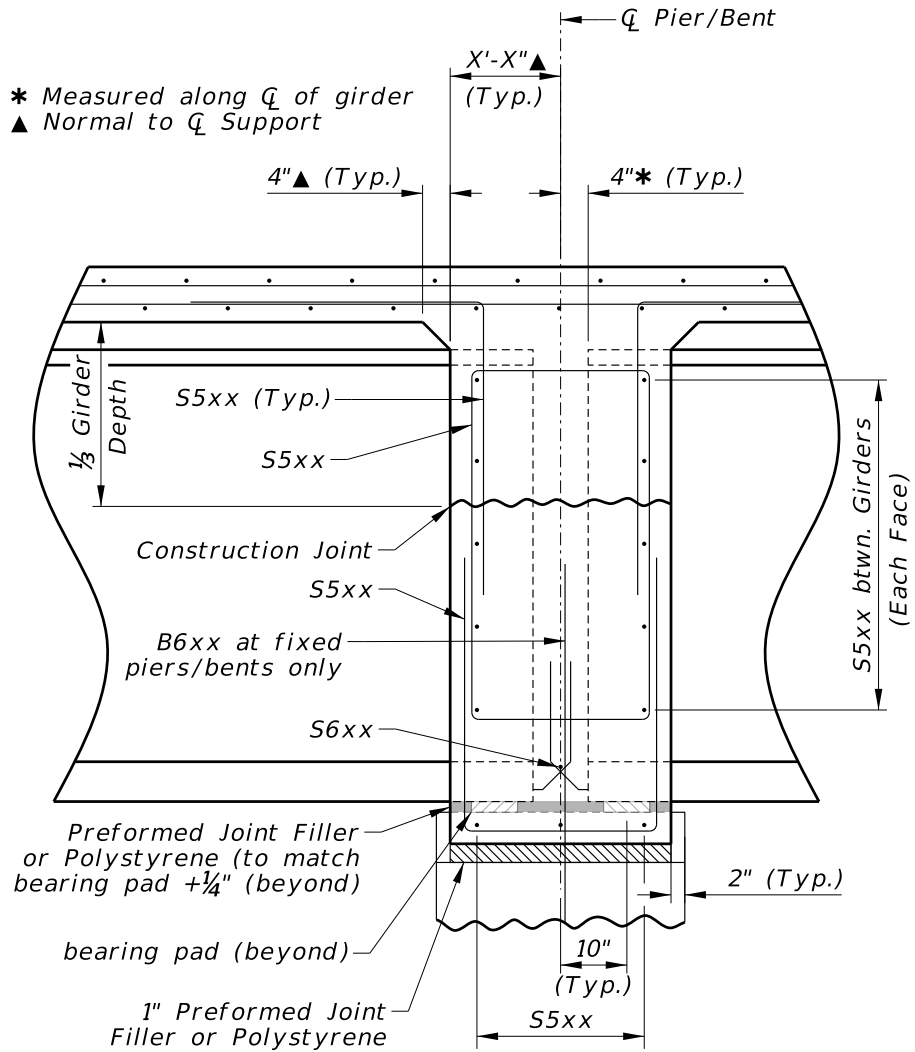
I Shaped Girder Diaphragm (Concrete or Steel)
